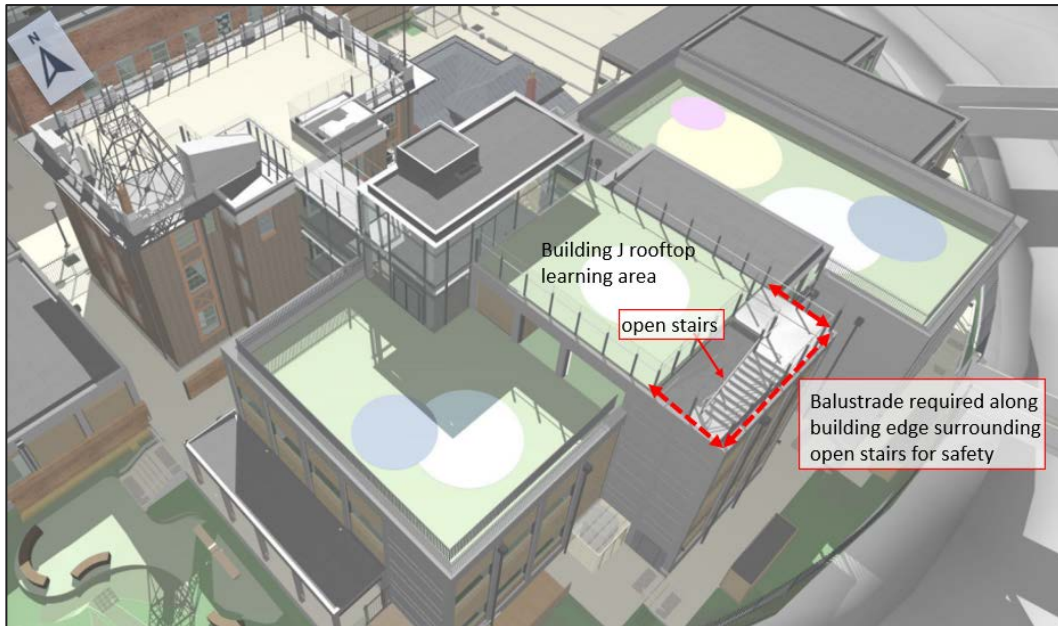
| Balustrade along southern edge of Building J rooftop (Source: SRtS 2021)
